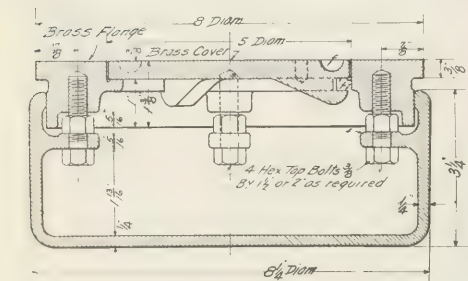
DETAIL OF SPECIAL LARGE, WATER-TIGHT, ADJUSTABLE FLOOR OUTLET BOX USED IN GENERAL WORKROOM ON FIRST FLOOR, FOR LOCAL LIGHTING OF FURNITURE AND MAIL-HANDLING EQUIPMENT
